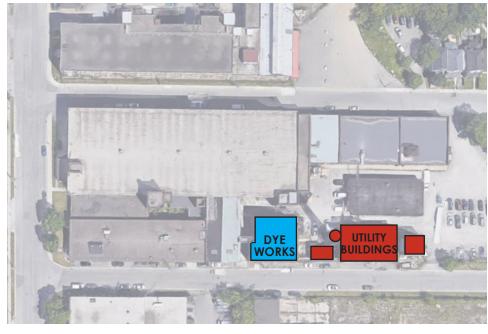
Site Plan (NTS) by mcCallumSather
